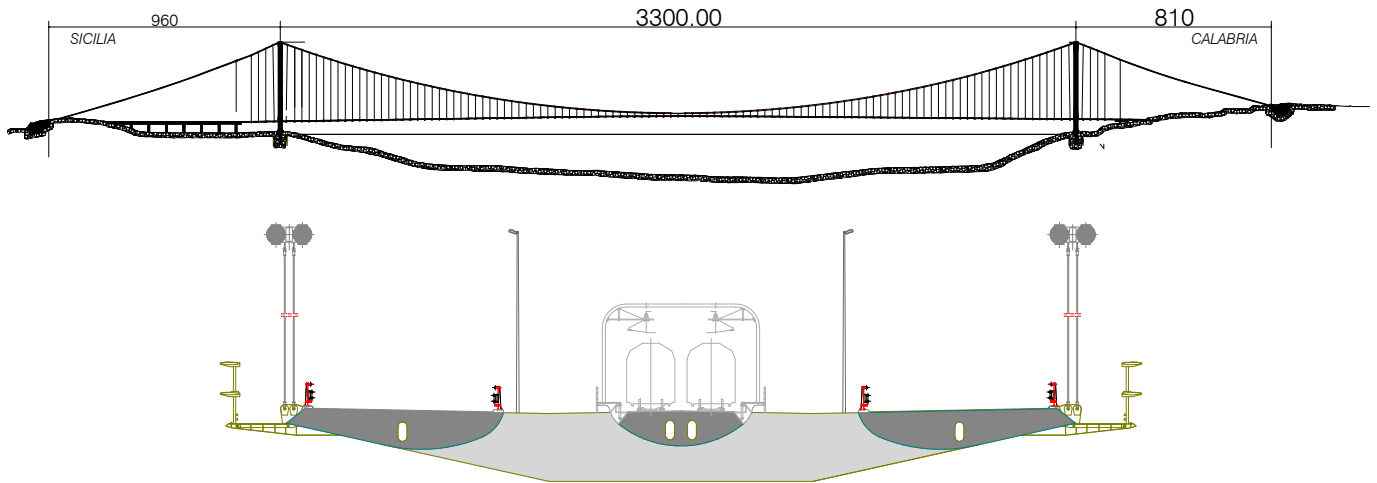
Messina bridge 3300 m span road cum rail bridge.
